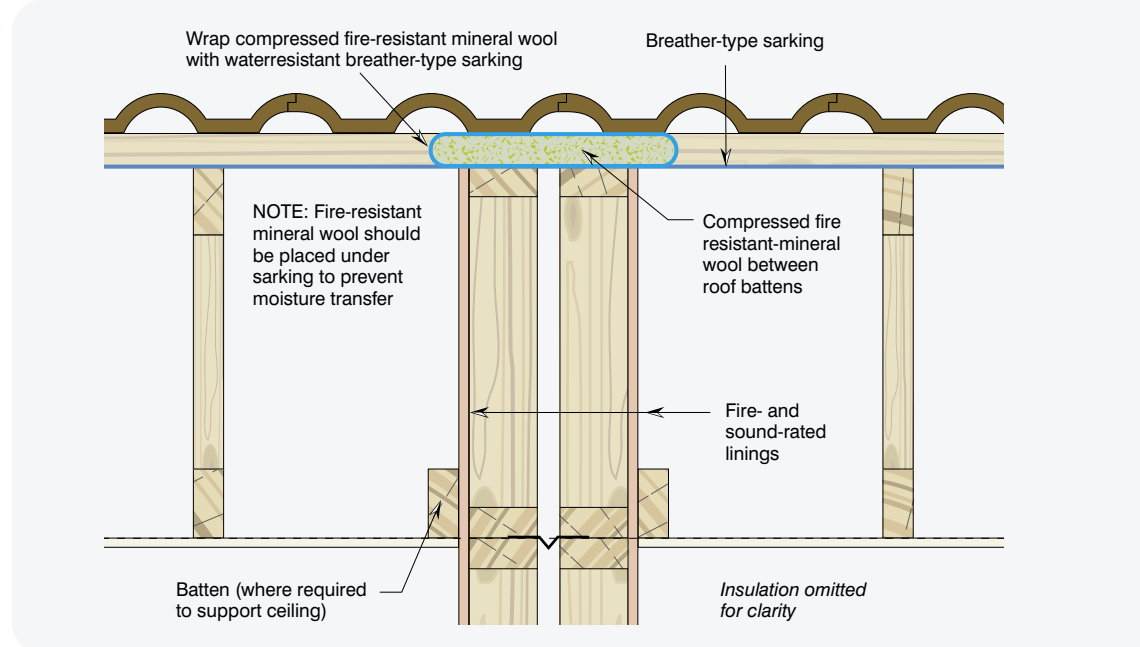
Double stud fire/sound rated wall in roof cavity – elevation view.
